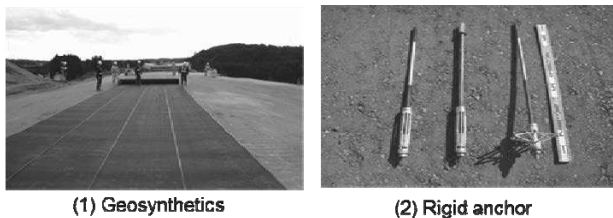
Structure of Confined-Reinforced Earth applied to asphalt concrete pavement.
